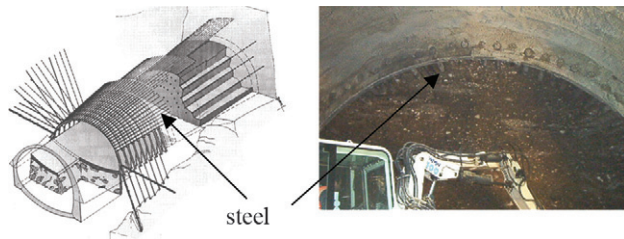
Scheme of a steel pipe umbrella intervention for an excavation head and bench with face reinforcement and underpinning of the steel stets (courtesy Geodata SpA, Turin) (left) and photo of an application in a granular soil (Turin metro excavation) (right).
